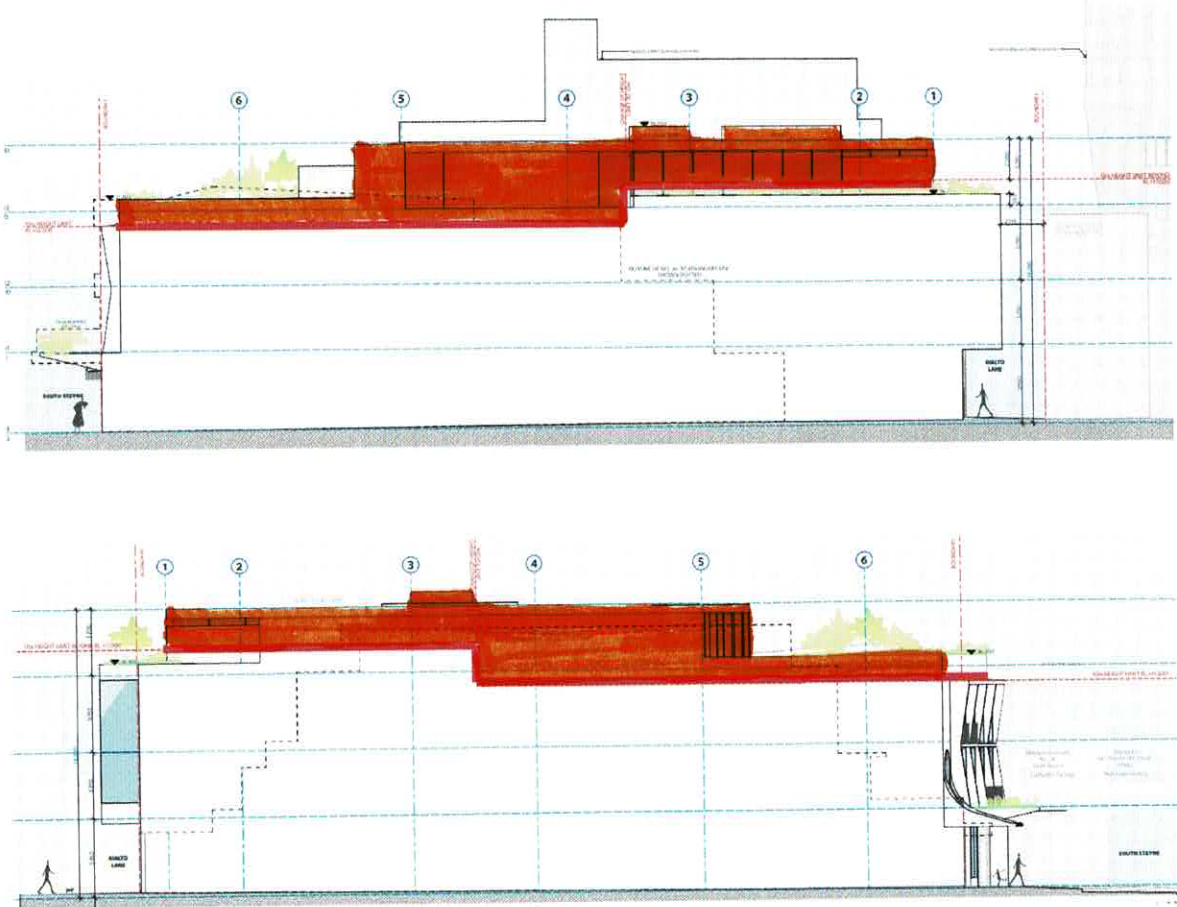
Elevation extracts showing the building height breaching elements on the 10 metre and 12 metre height limit affected portions of the site.
